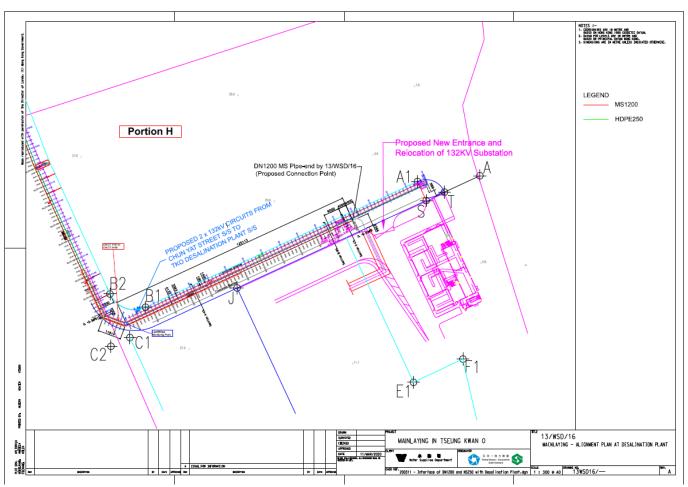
Location Plan for Portion H: CH.CT 0+07 – 2+58
